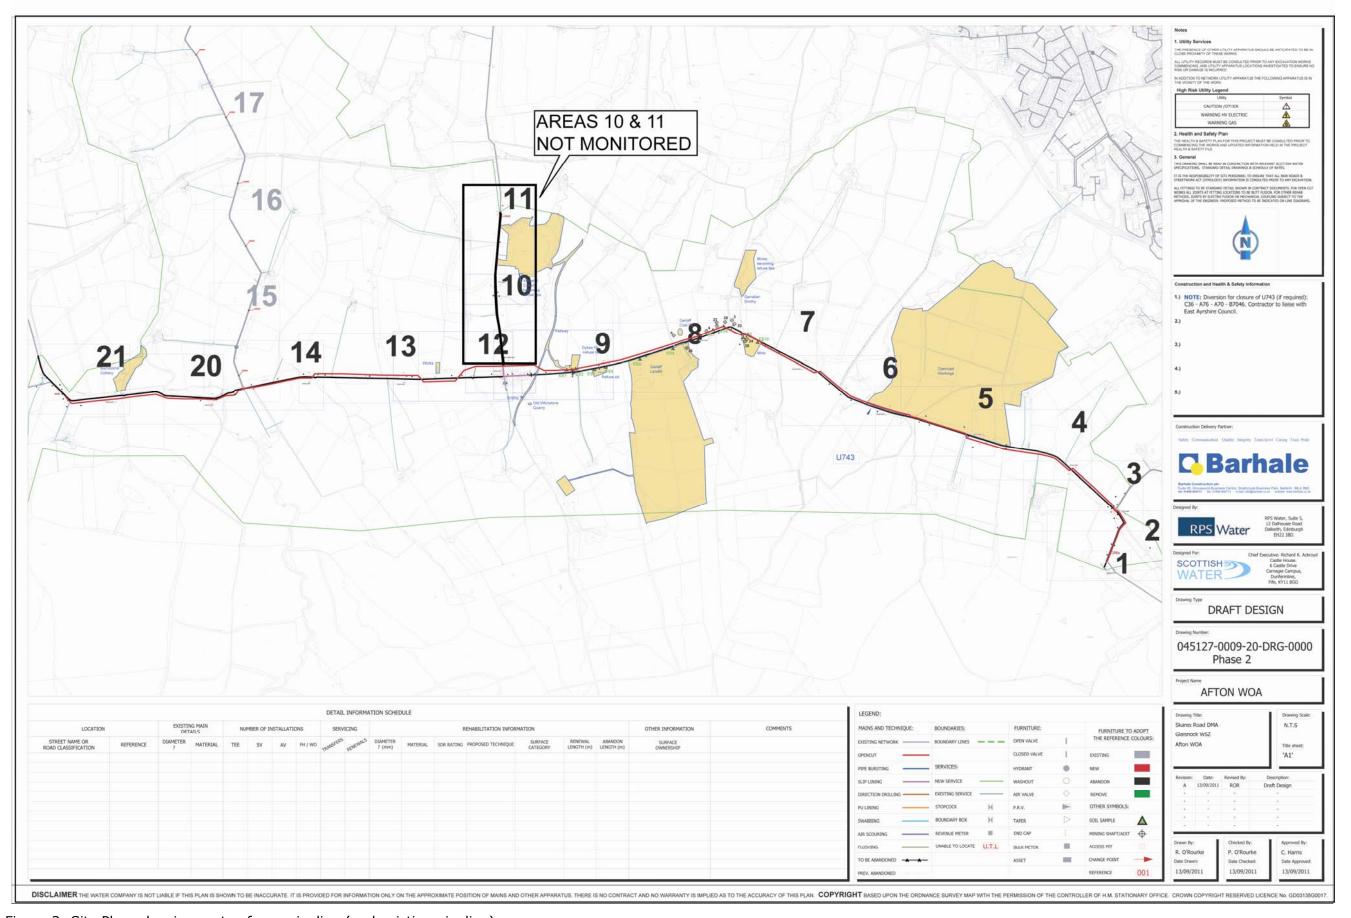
Site Plan, showing route of new pipeline (and existing pipeline)
